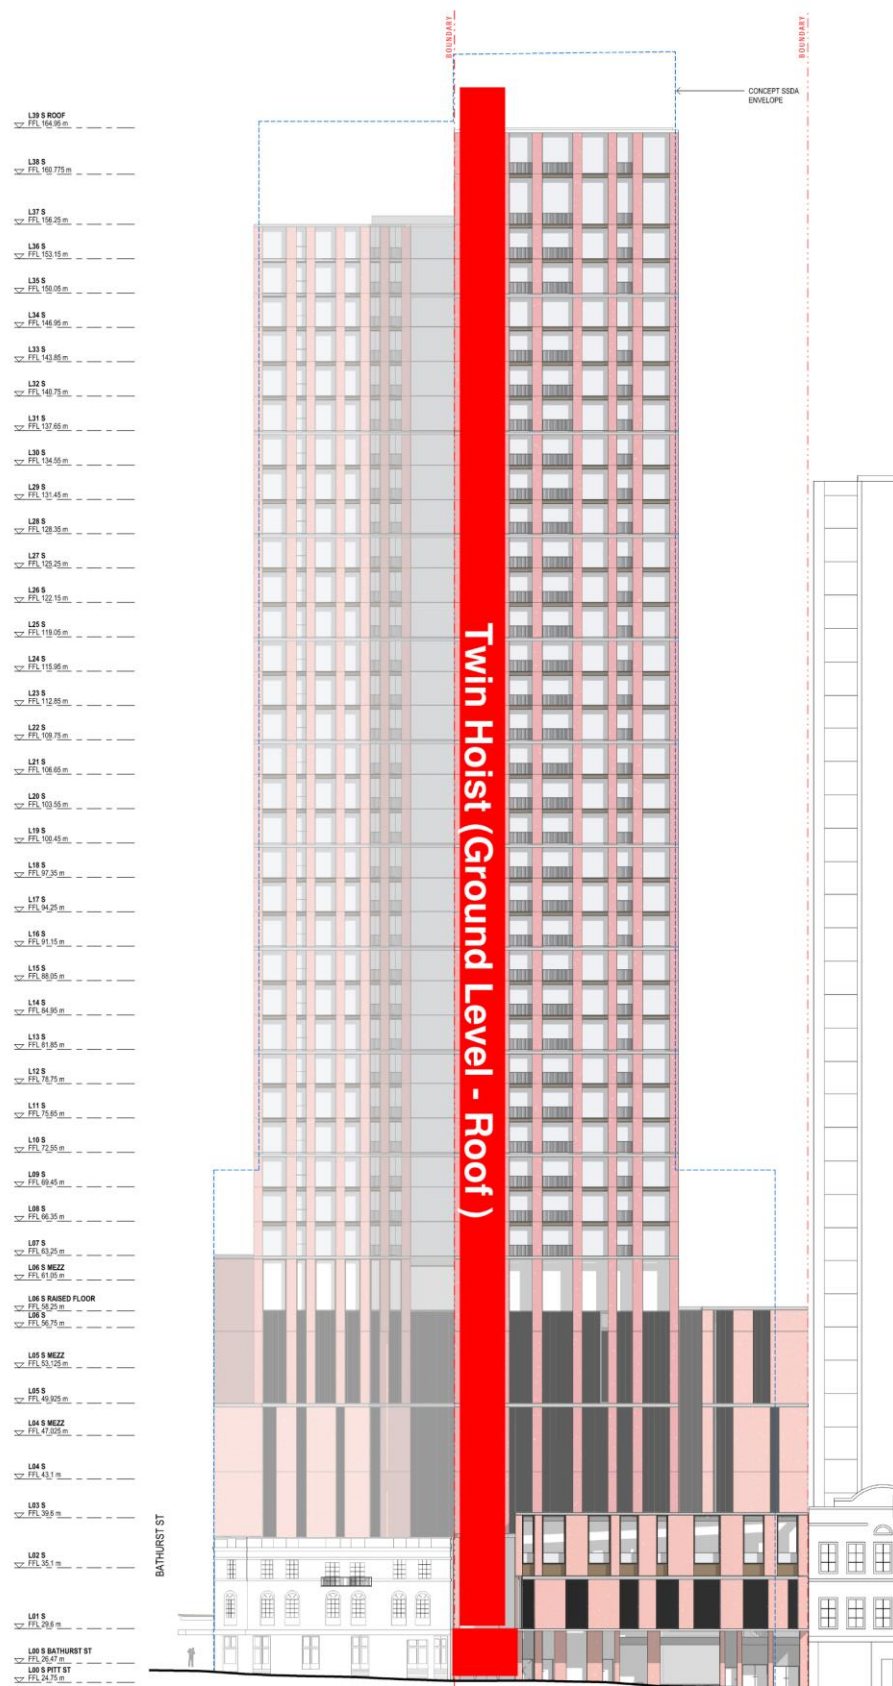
South Tower – Materials Handling – Twin Hoist Elevation
